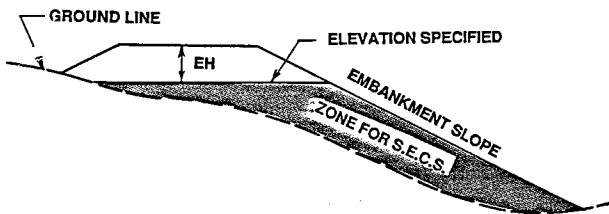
Typical Configurations for Embankments Stabilized Using the Special Shale Embankment Construction Specification.
